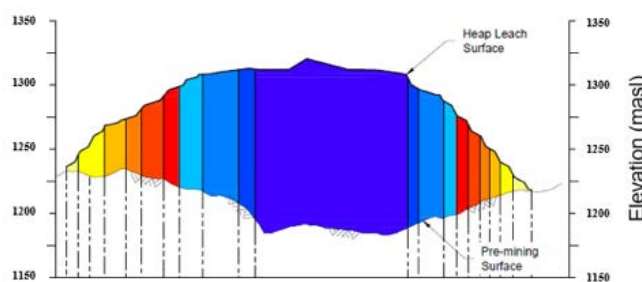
Typical cross-section of heap leach facility showing column discretization by height
